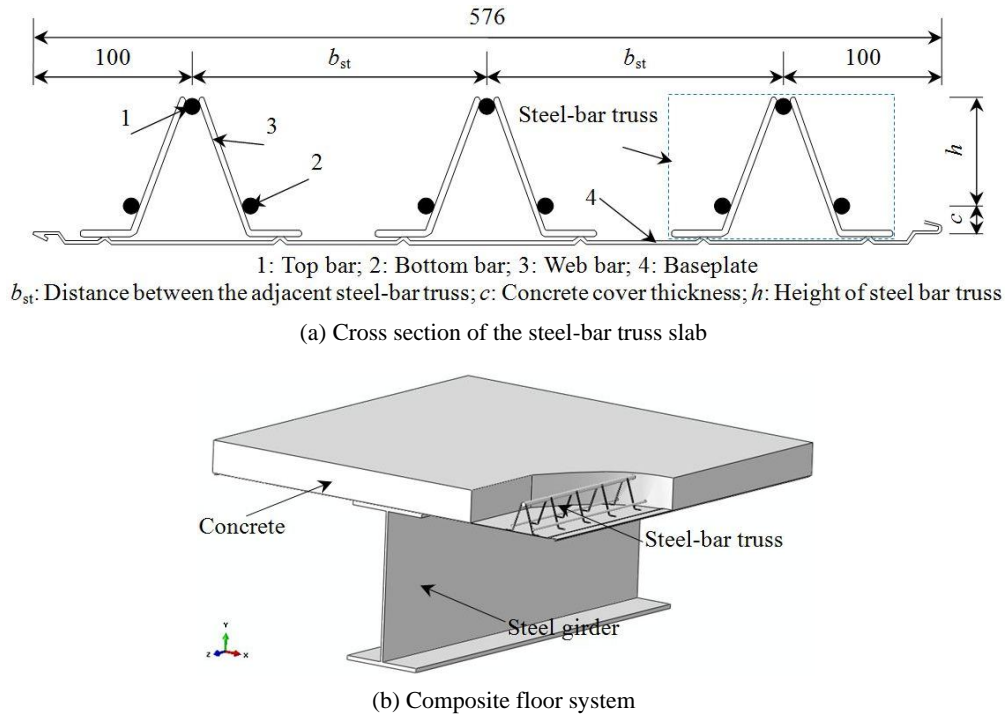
Diagrams showing the composite steel-bar truss slab with steel girder (unit: mm)
